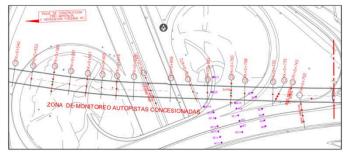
Monitoring Point Plan Frei Montalva Inter-Station Tunnel Crossing with Freeways
